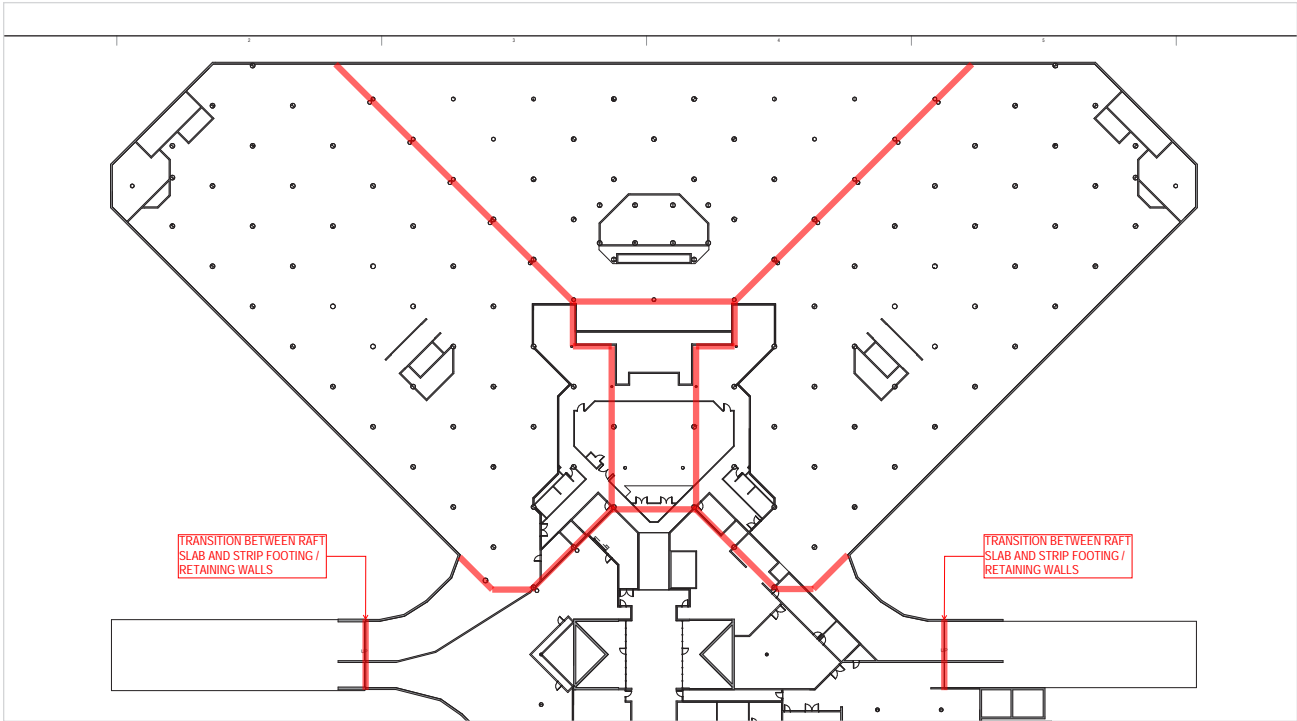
First floor expansion joint locations overlaid on basement ceiling (shown in red).
